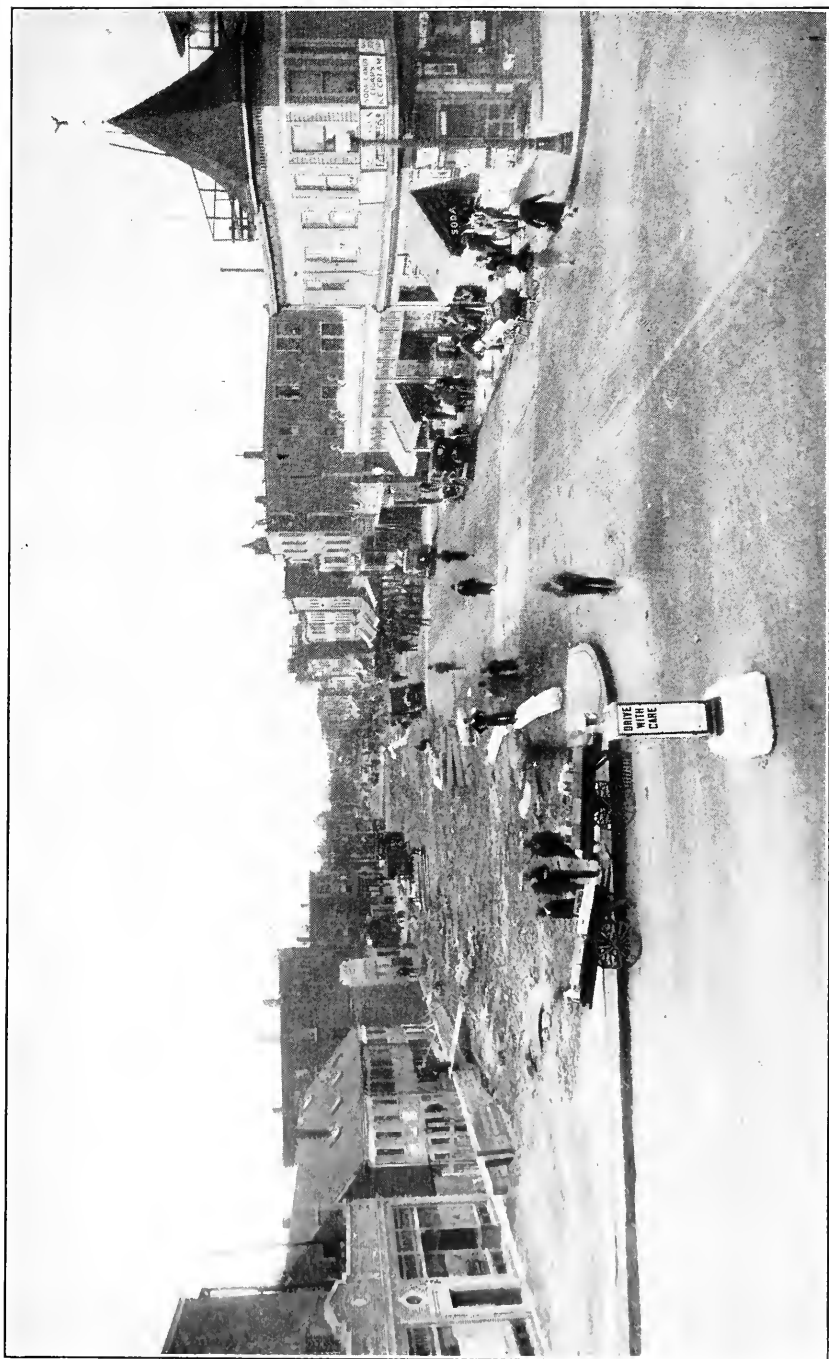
PLATE XII.—SHOWING WIDTH OF PORTER STREET BEFORE BUILDINGS WERE REMOVED AND THE WIDTH IT WILL BE AFTER THE WIDENING.
